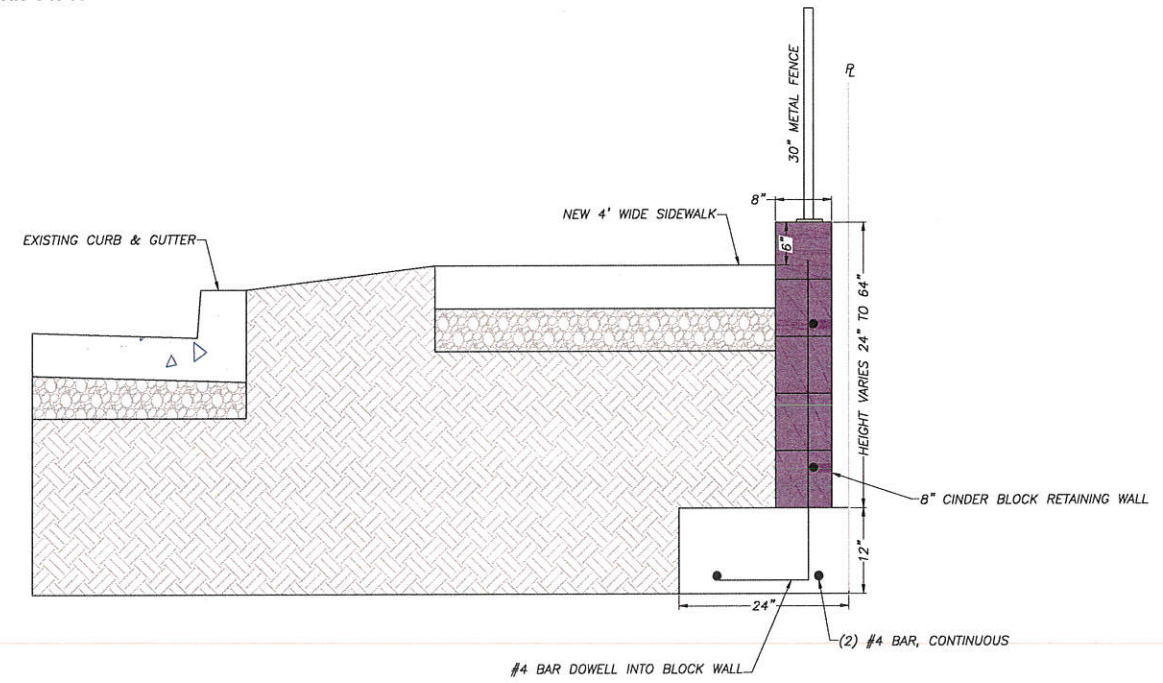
# DETAIL SHEET FOR: LEEDS LEEDS MAIN STREET IMPROVEMENTS
